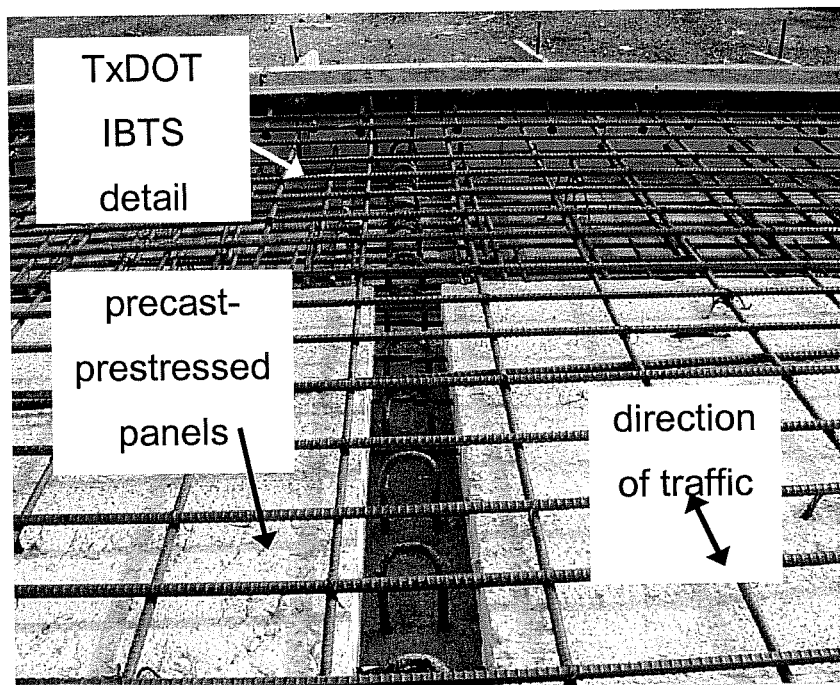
Prestressed panels and shear stirrups (Ryan 2003)
